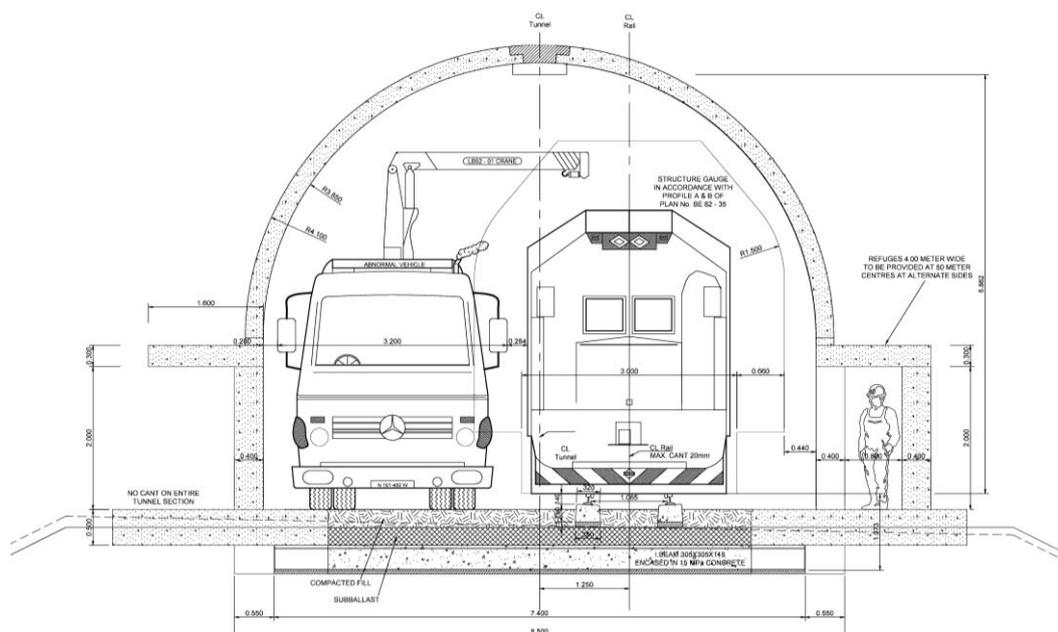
Tunnel Cross Section Proposed on the Aus-Lüderitz Railway Line [14]
